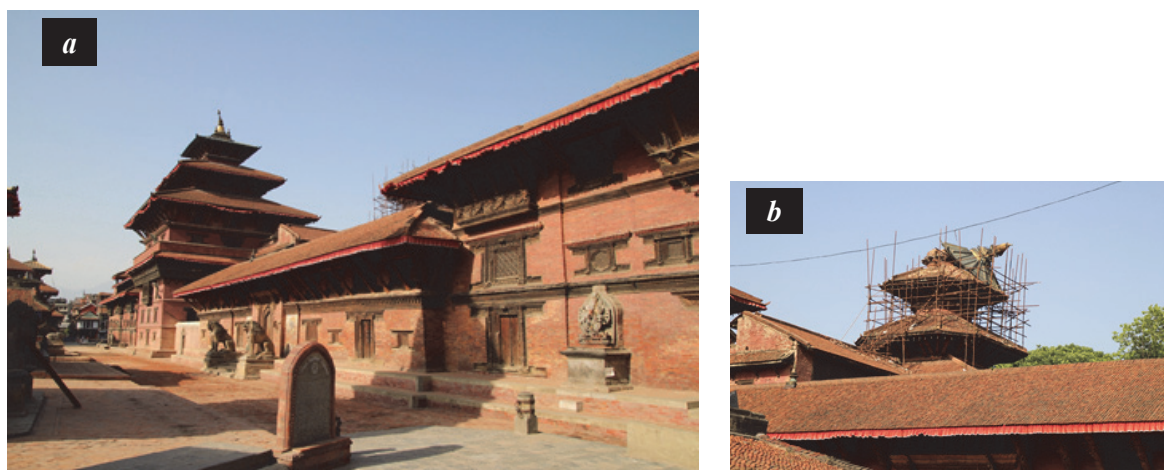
In Patan, after the earthquake, this place (*a*) had partial damage at top of structure parts (Gajur and Baymvah) (*b*) (photo by T. Ohsumi).
